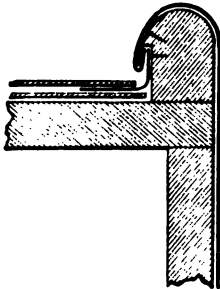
Upper Edge of Lower Cheek of Dormer
